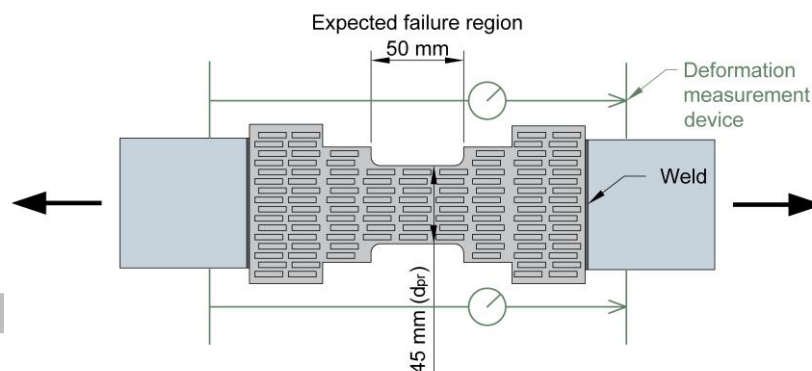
Test specimen configuration for the tensile resistance of the metal connector plate of Category C fasteners
